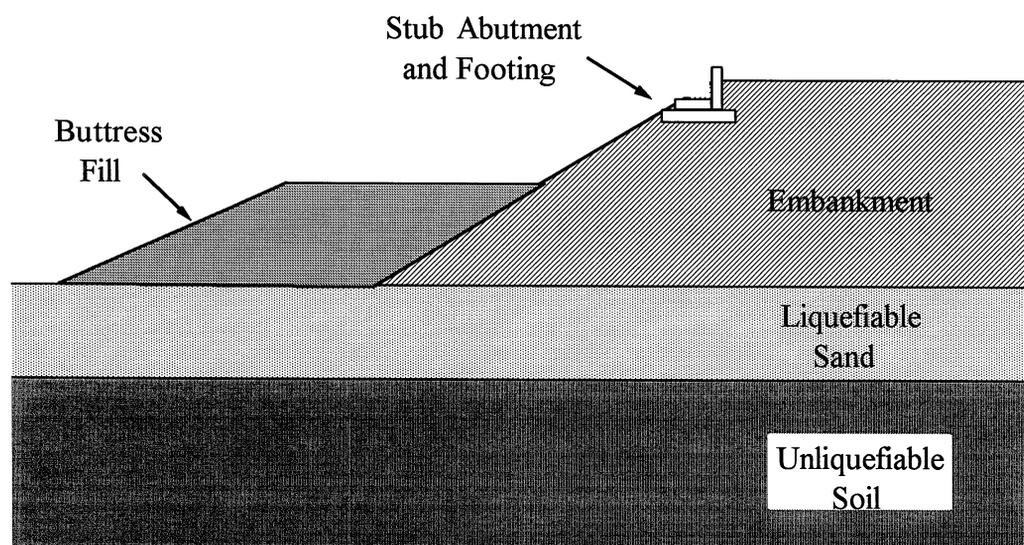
7 Section Showing Buttress Fill at Toe of Approach Embankment
